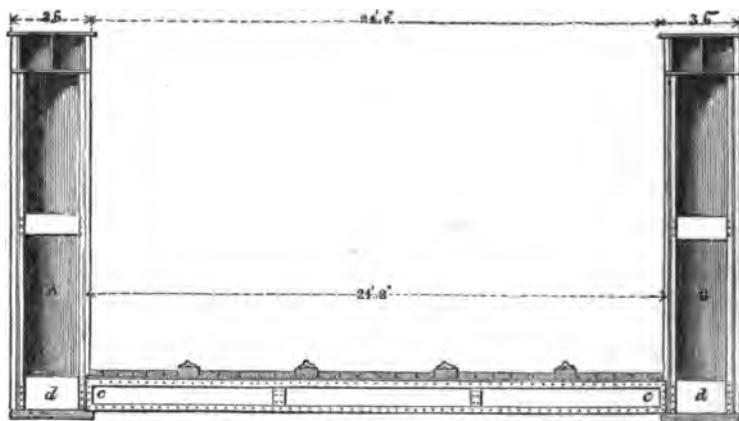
TRANSVERSE SECTION OF SPEY BRIDGE.
